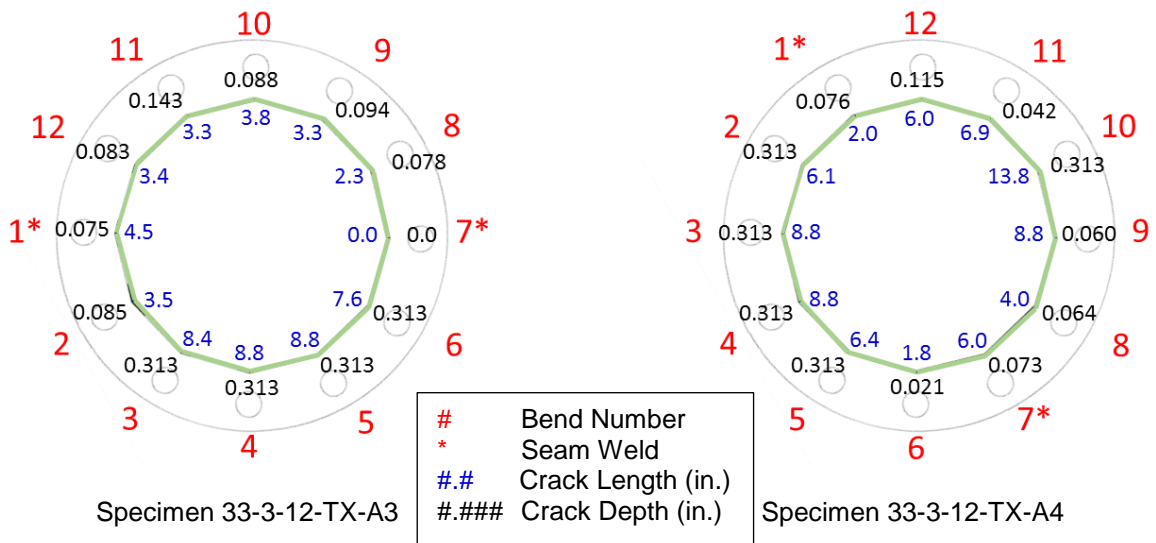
Specimens 33-3-12-TX-A3 and 33-3-12-TX-A4: Cracks after 43.0 Million Fatigue Cycles in Test 6
